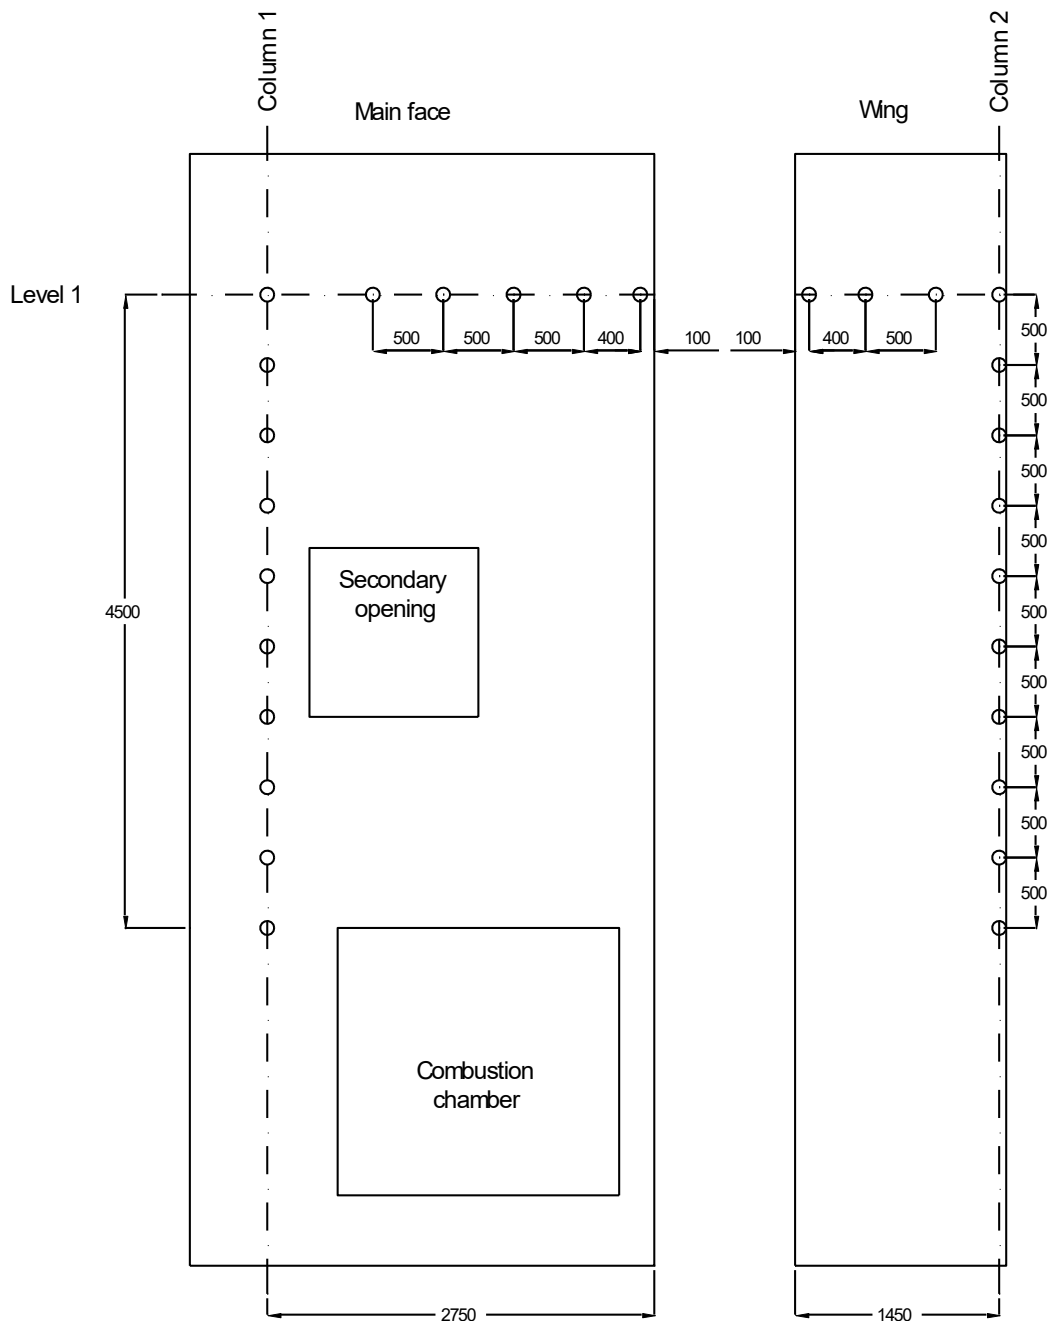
Positions of thermocouples on the exposed face of the tested façade.
